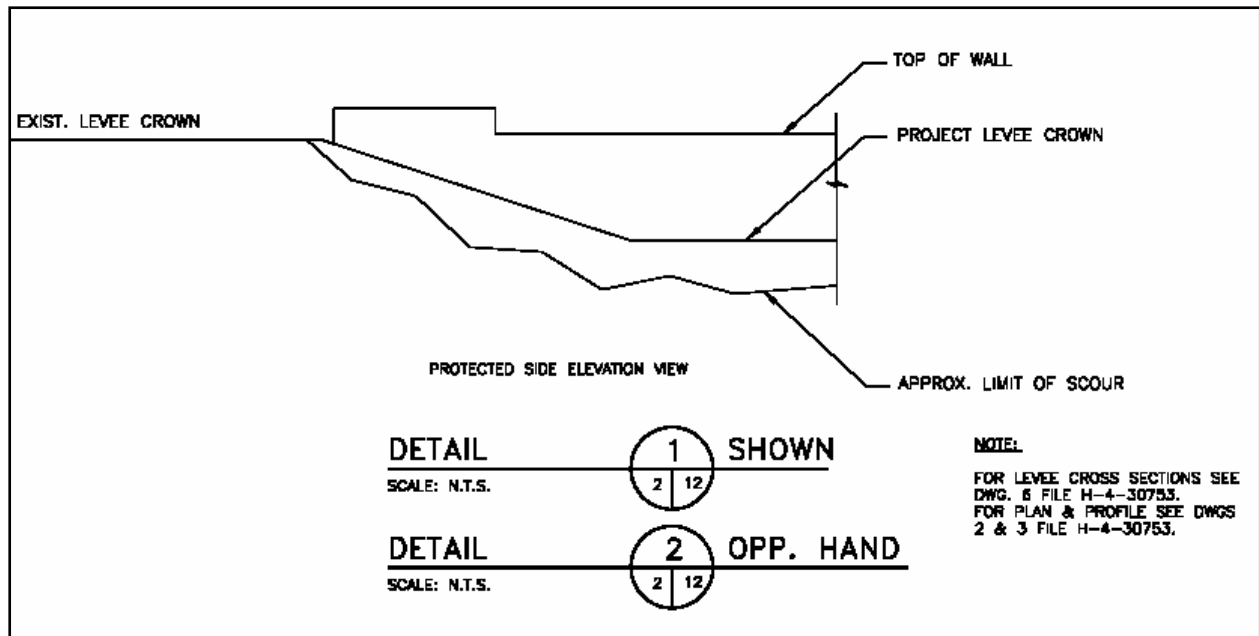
Details at Floodwall / Levee Abutments, Both Ends of Gates S2 and S3
